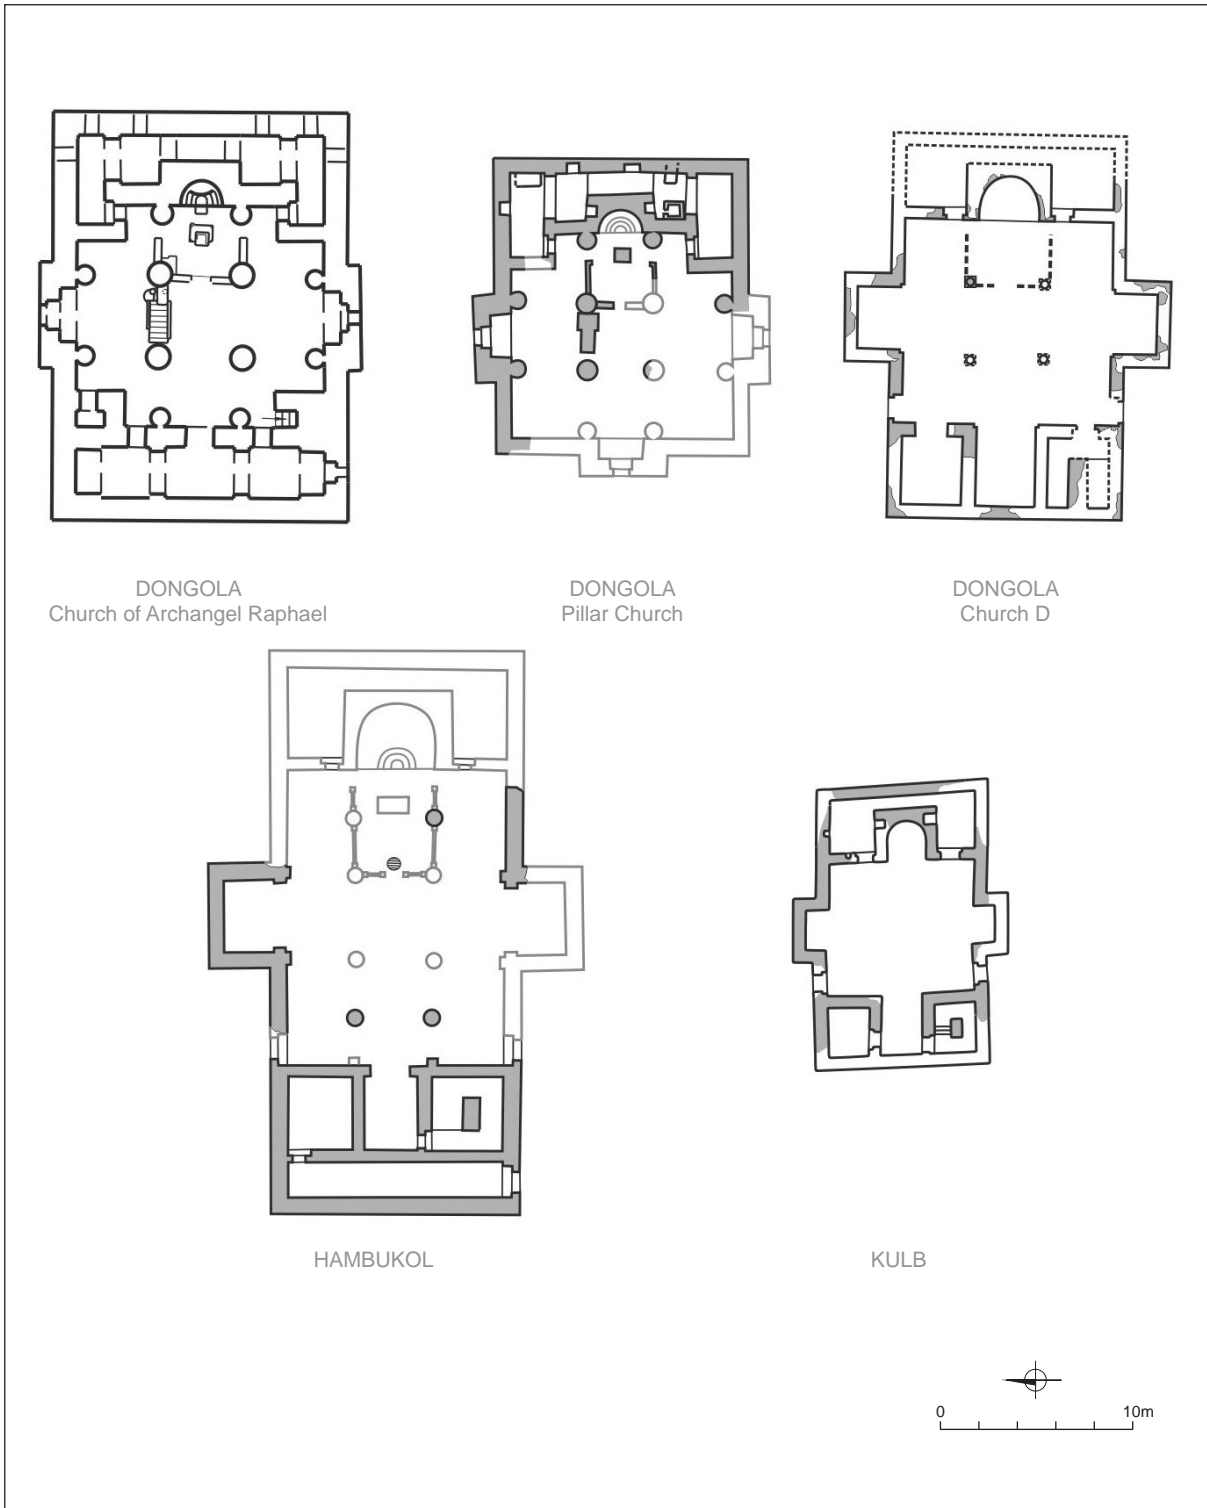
Sacral buildings in Dongola: Church of Archangel Raphael, the Pillar Church and Church D, and churches in Hambukol and Kulb, inspired by Dongola church designs
